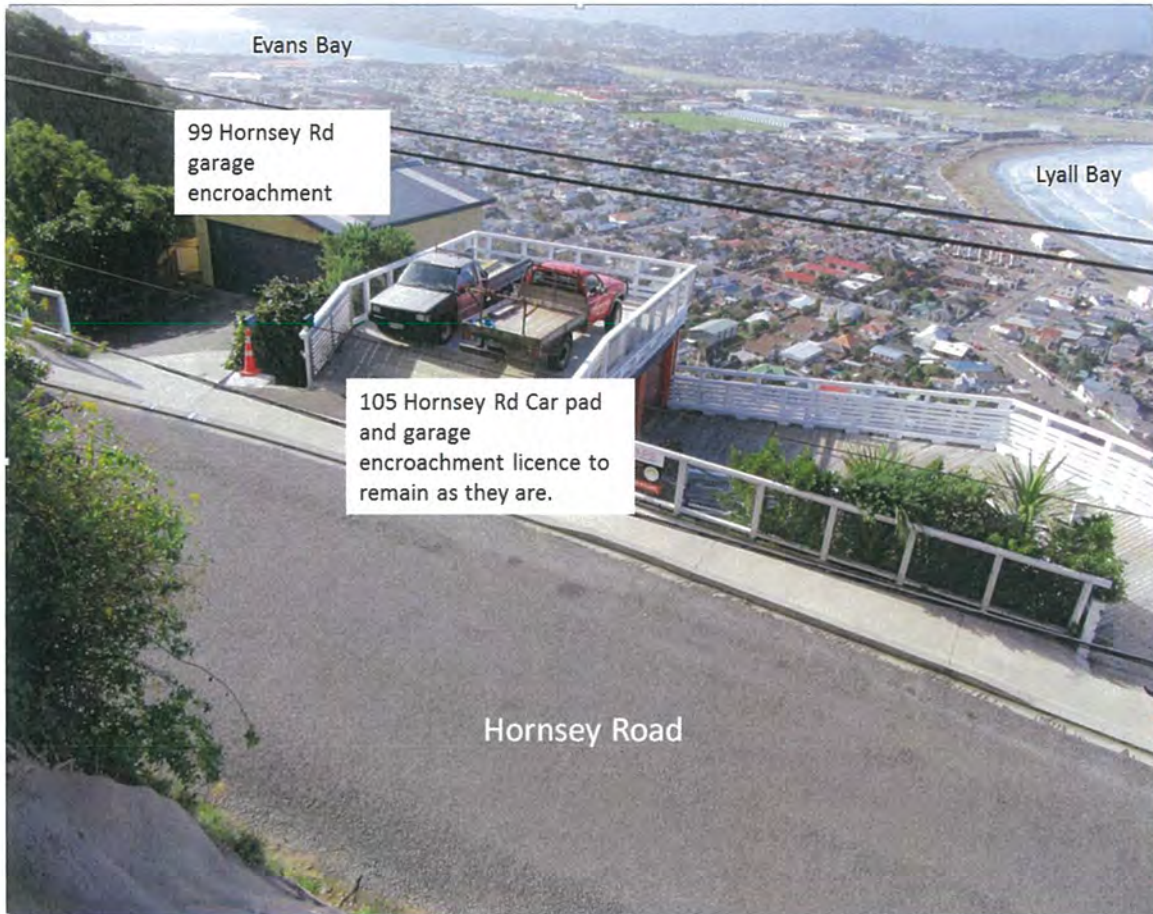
Hornsey Road showing relative level between car deck and ramp at street level and dwelling below – looking north towards Evans Bay.
